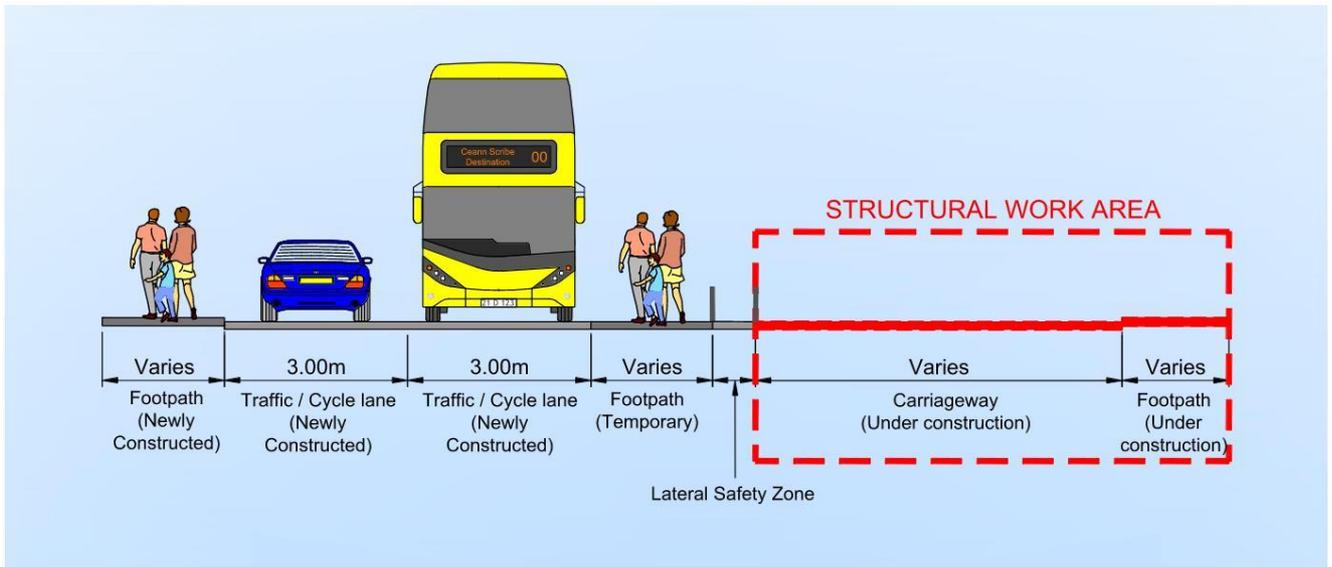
Traffic Management Cross Section, Section 3d, Royal Canal Bank Underpass – Stage 2
